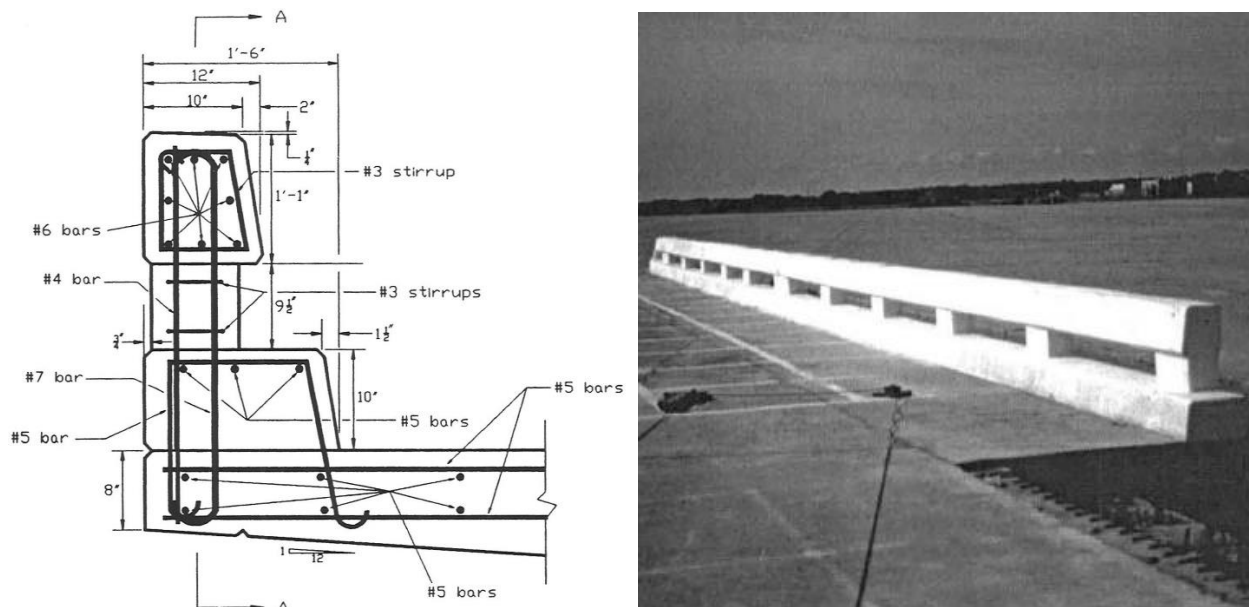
Natchez Trace Bridge Rail Design Details [2]
